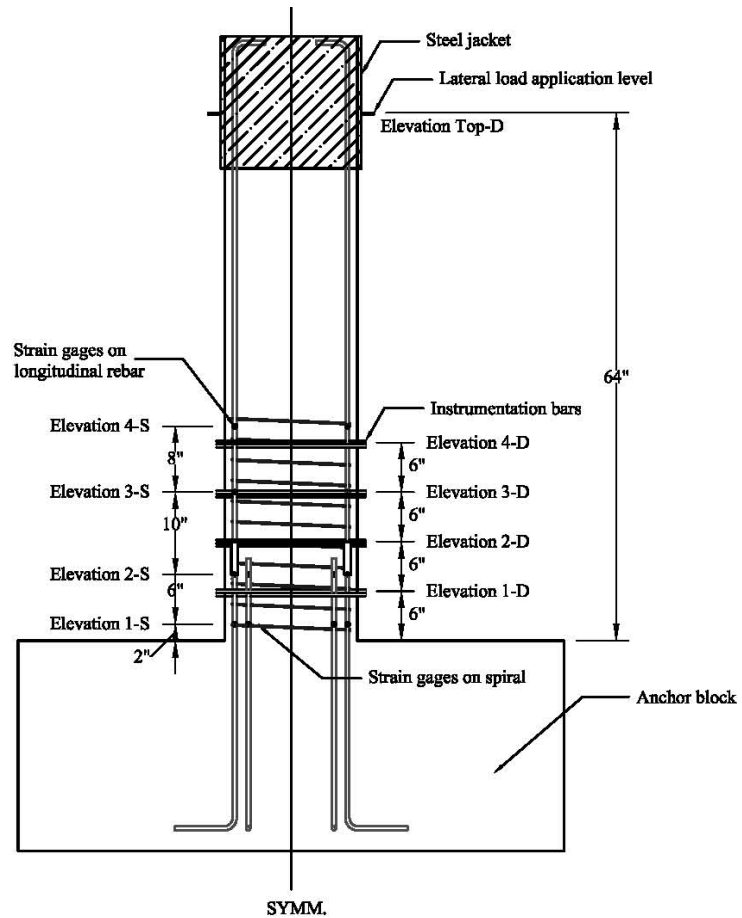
Strain gage instrumentation scheme for S2 specimen
